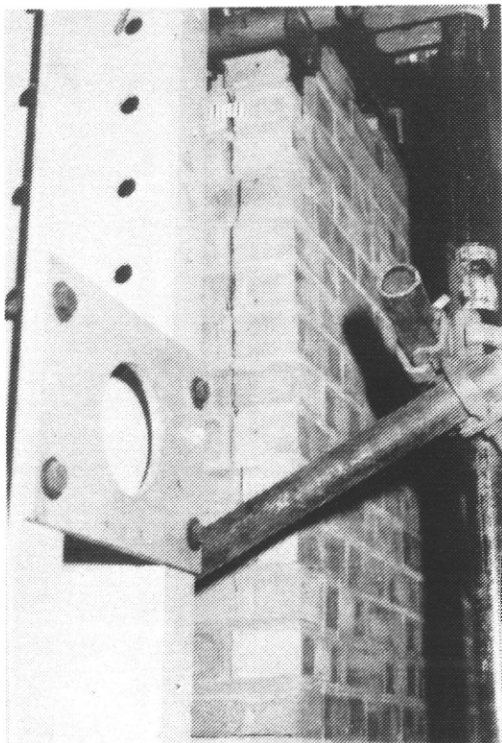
Vertical cracking along edge of wall (Test W2).
